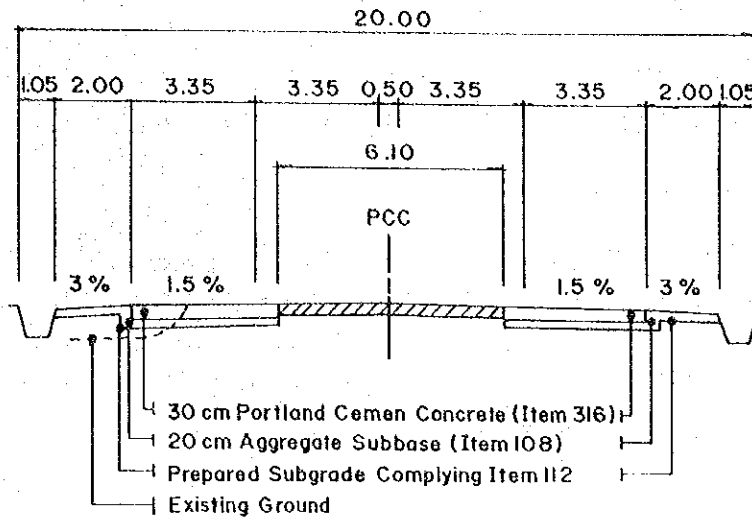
PROPOSED WIDENING TO FOUR LANES CALAMBA – STO. TOMAS SECTION
